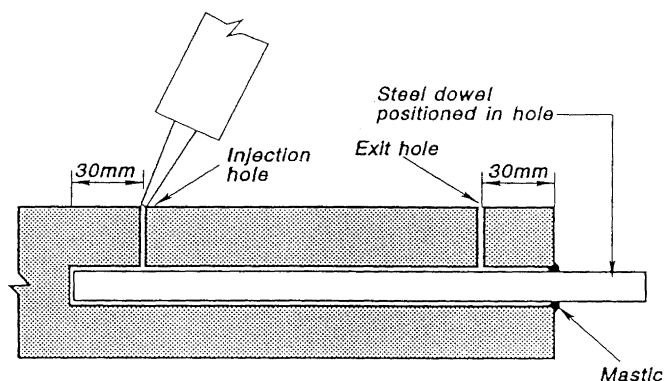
Arrangement for placing epoxy around steel bar in glulam.
